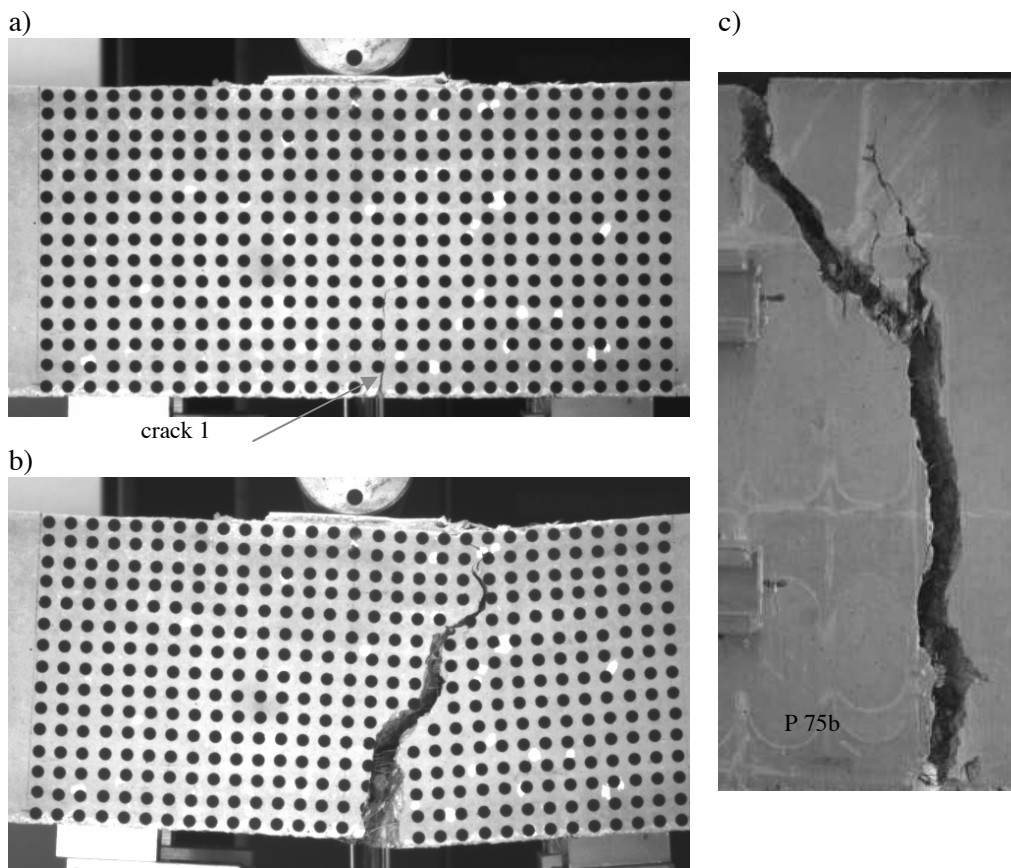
Cracking of the beam: a) crack at P_{max} and b) crack at failure, observed by photogrammetry analysis; c) crack pattern on tensile beam side.
